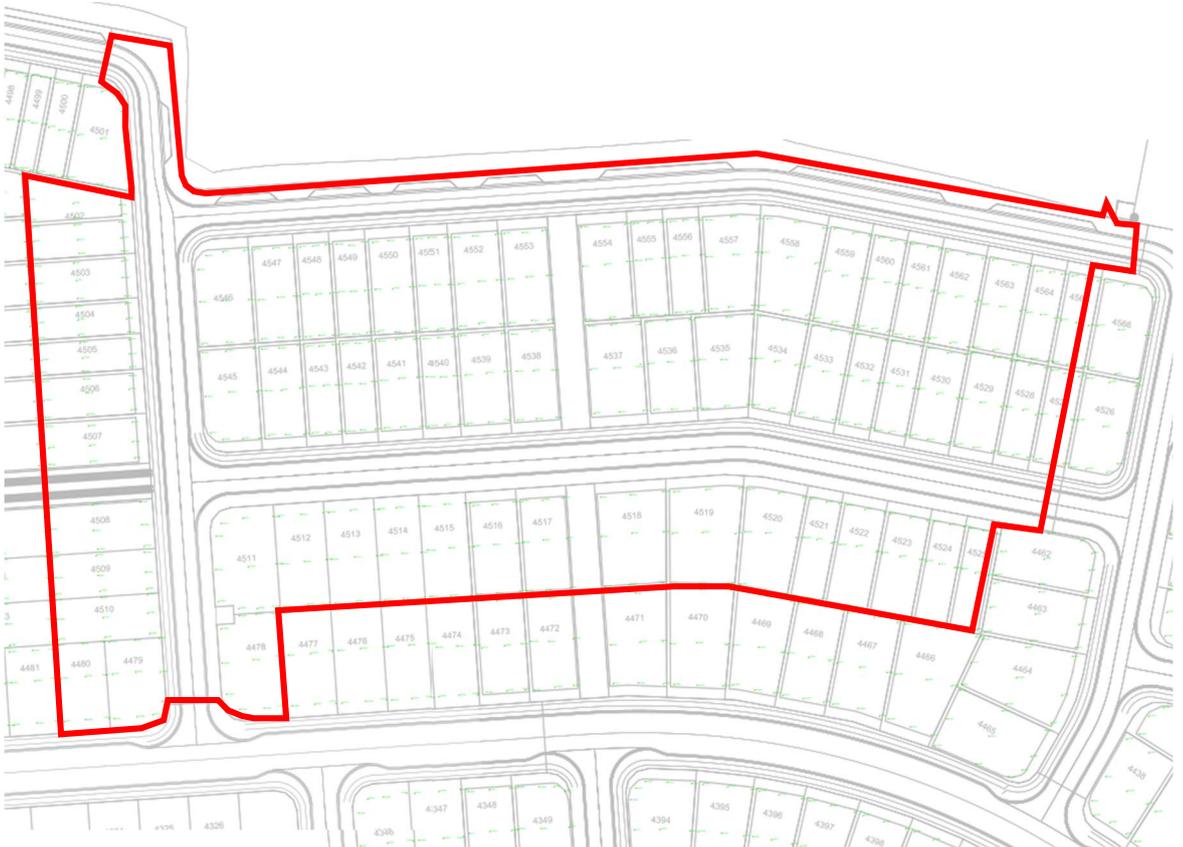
Actual Constructed Area of Fill (100mm BFSL) - Shadforth Survey Plans
